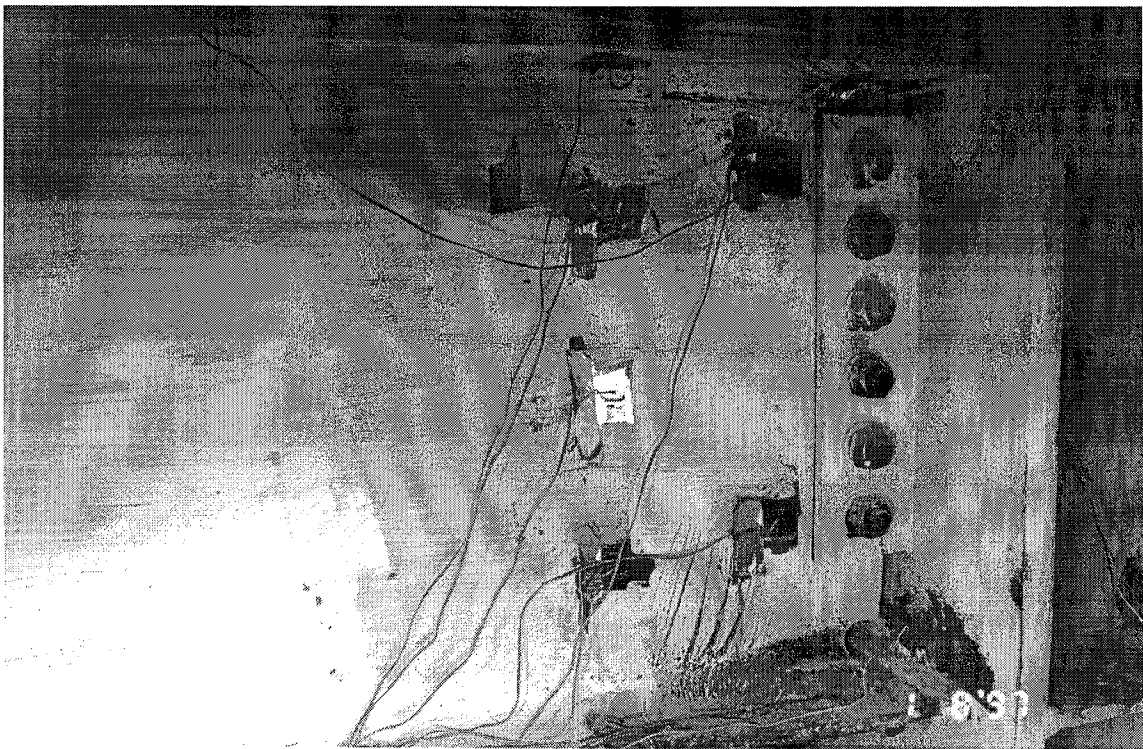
SW Connection Region (West Girder of Specimen 2)
